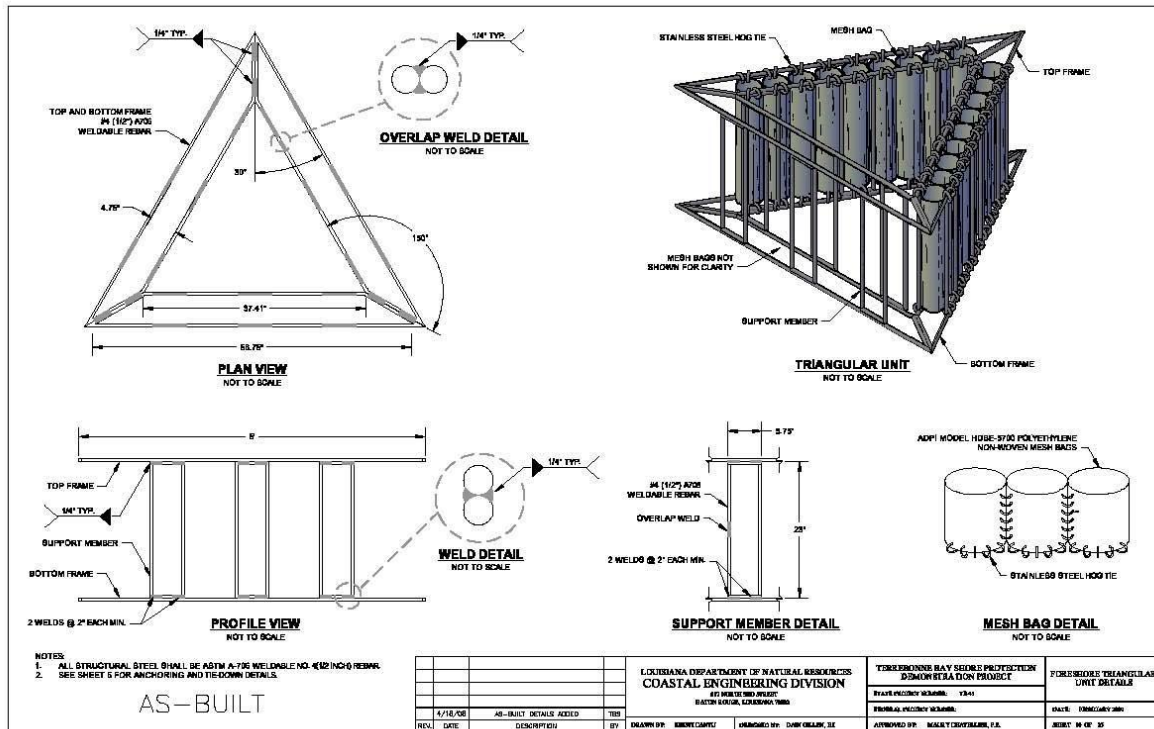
Design drawings showing the Terrebonne Bay Shore Protection Demonstration (TE-45) project's ReefBlk structure.
